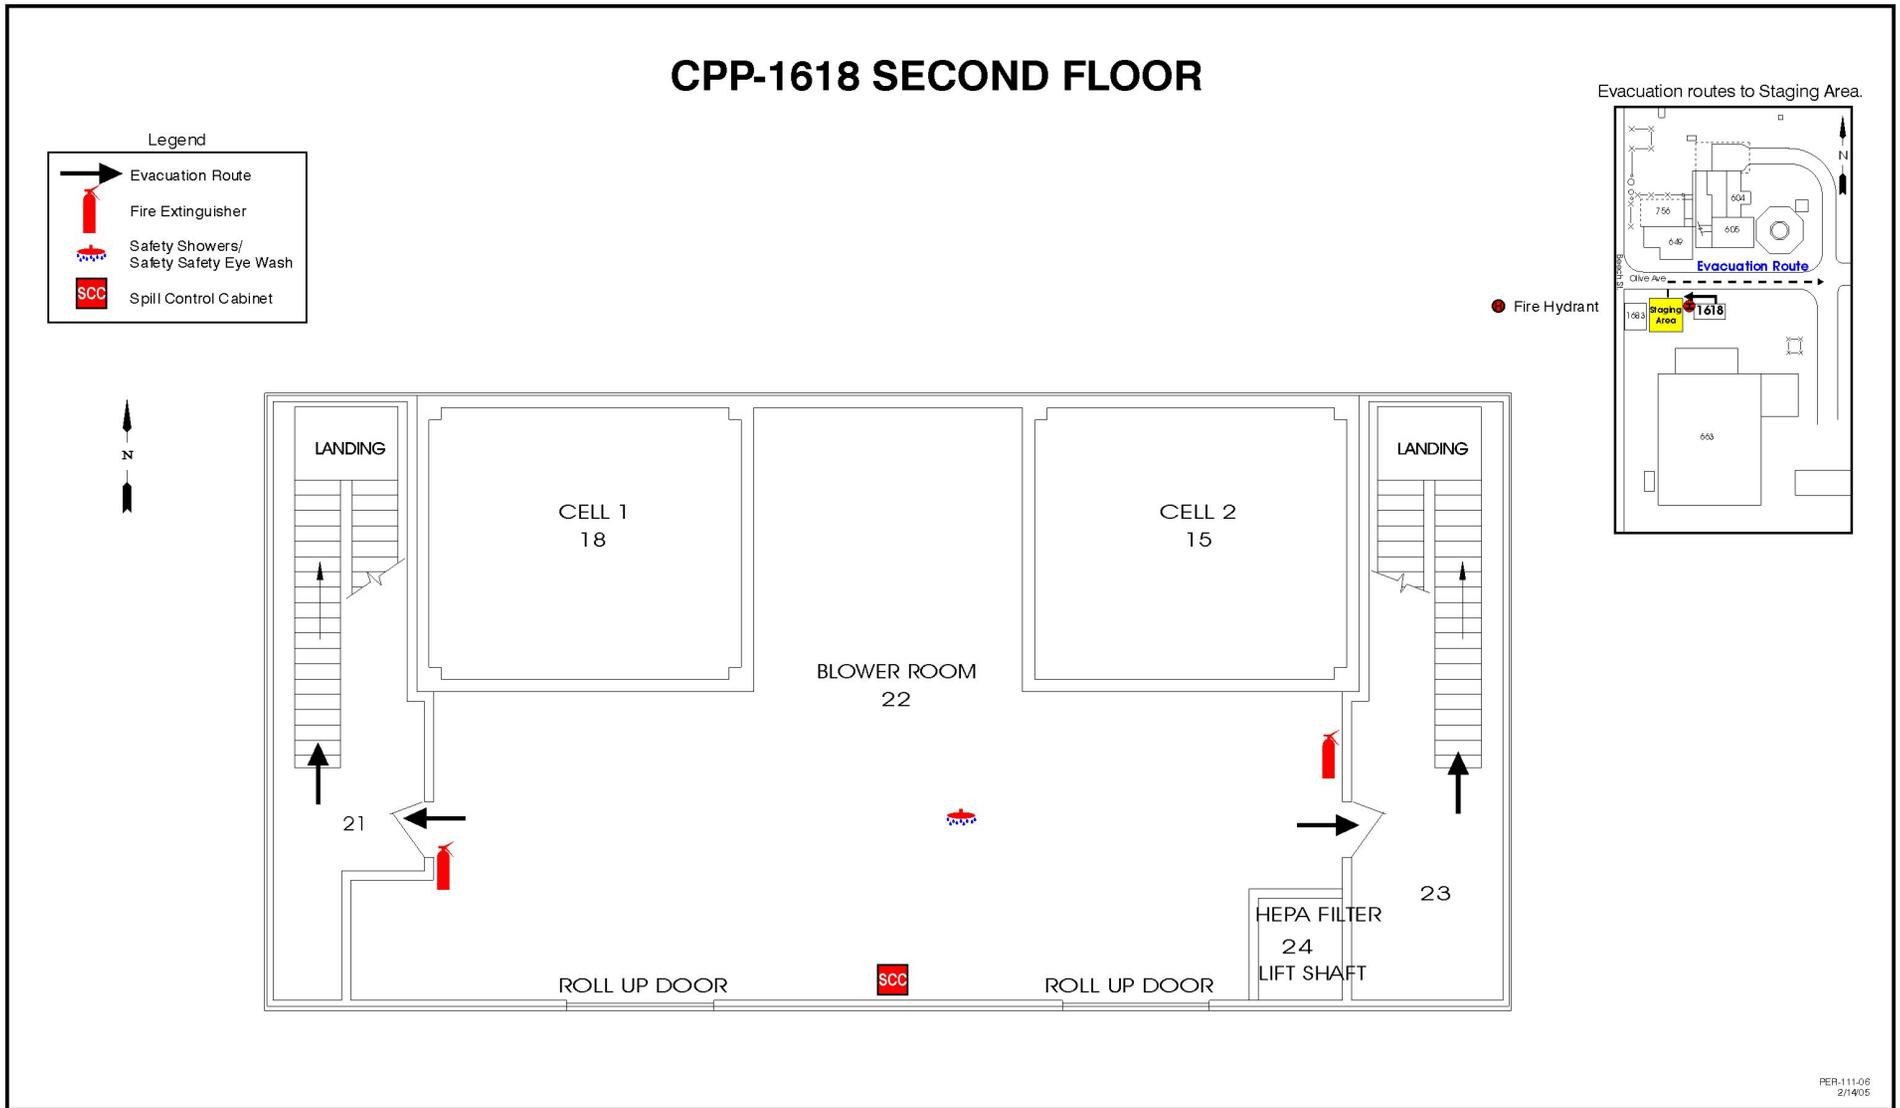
Evacuation Routes and Emergency Equipment, Second Floor CPP-1618
